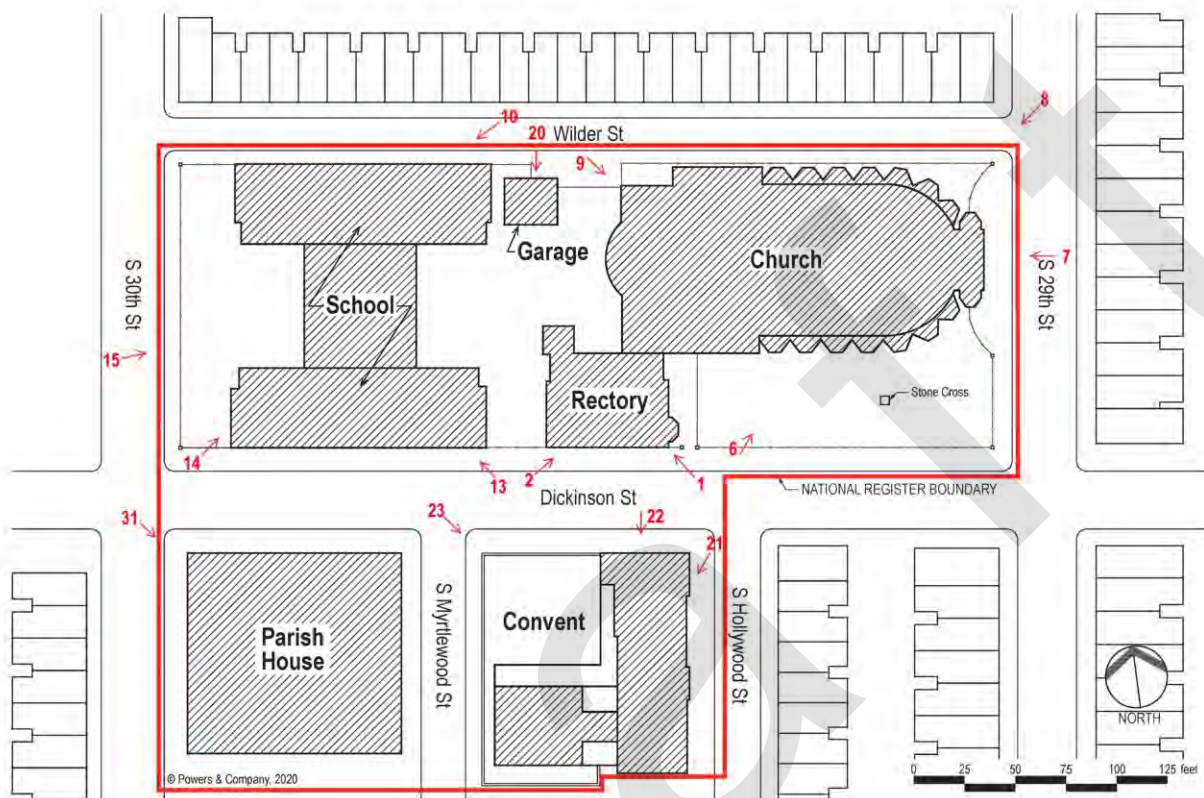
Site Plan with proposed NRN Boundary and Exterior Photo Key
